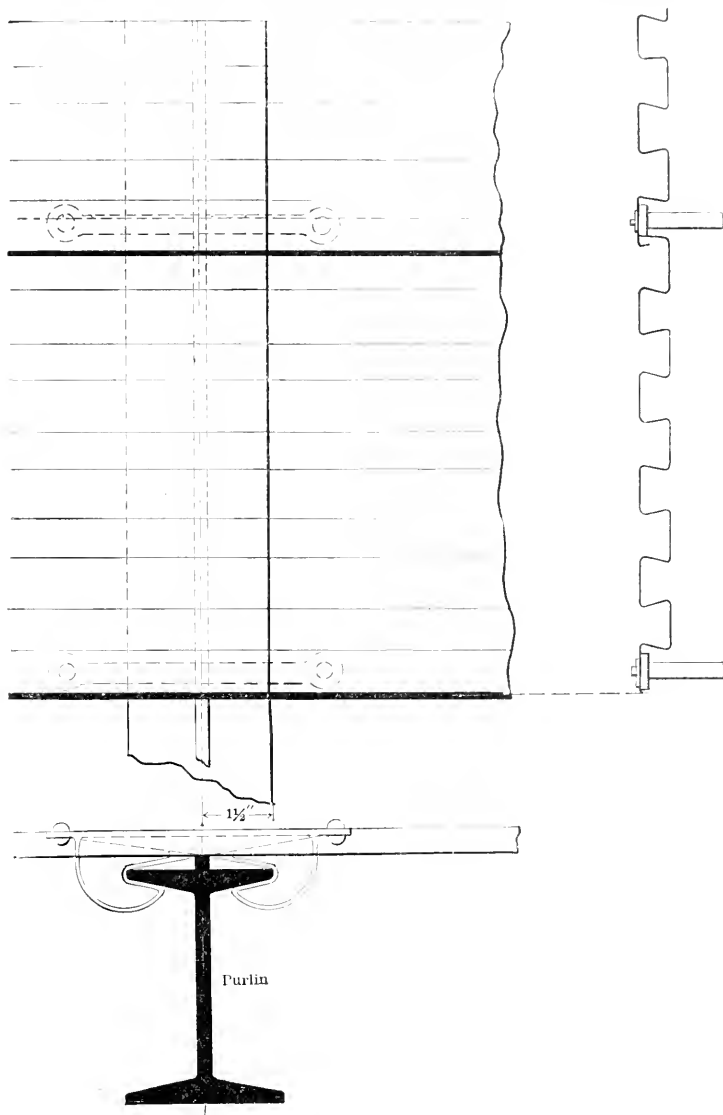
SECTION THROUGH PURLIN AND FERROINCLAVE.
